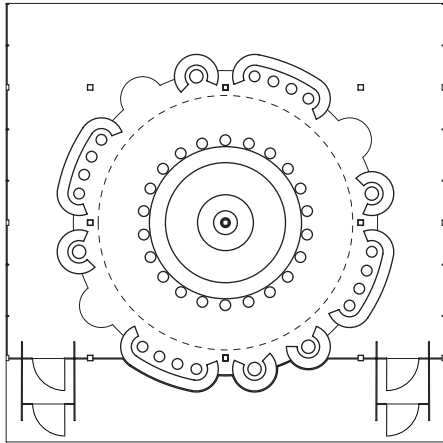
Floor plan of the Midnight Sun Cocktail Bar.
